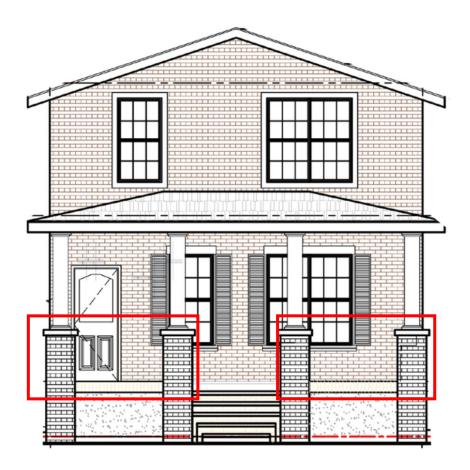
Figure C: Front Elevation Does Not Indicate Porch Railings as Part of the Design
